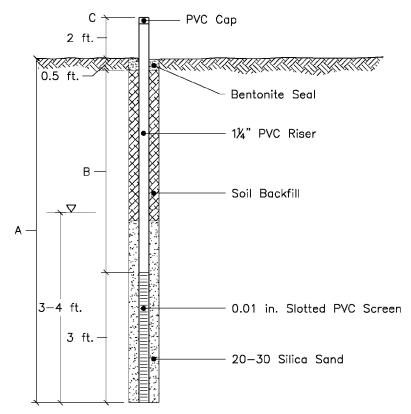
Construction Details for Groundwater Monitoring Wells.
